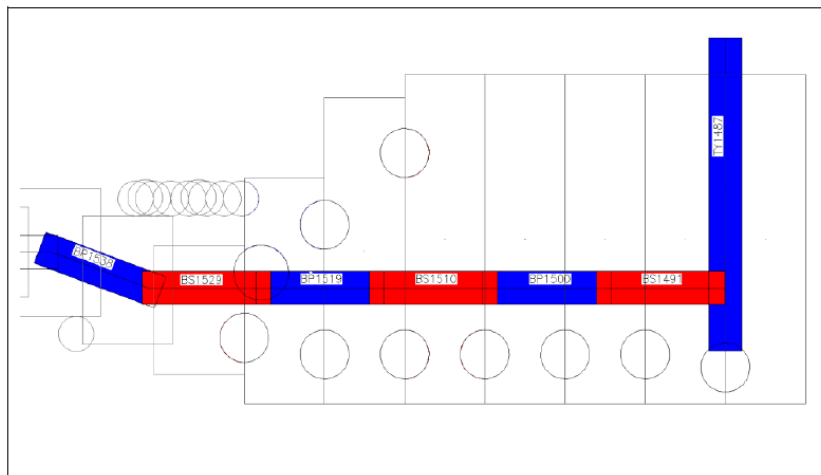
Layout of barrier wall panels along the monolith 29 with perpendicular tie-in-panel element TY1487.
